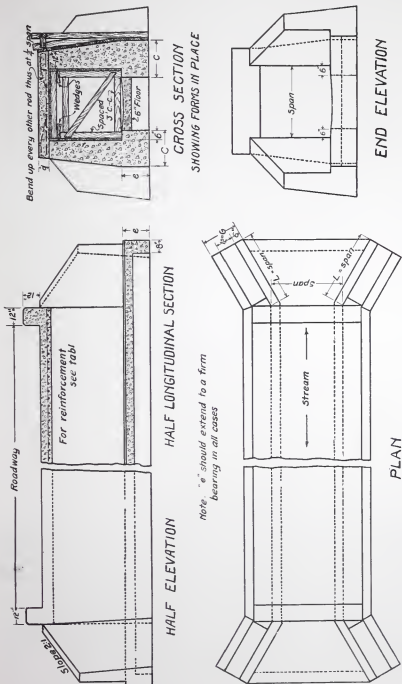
Typical Design. Reinforced Box Culvert, 3 to 10 feet in span.
